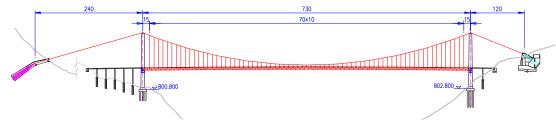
Overall layout of the Jindong Bridge (Unit: m)
